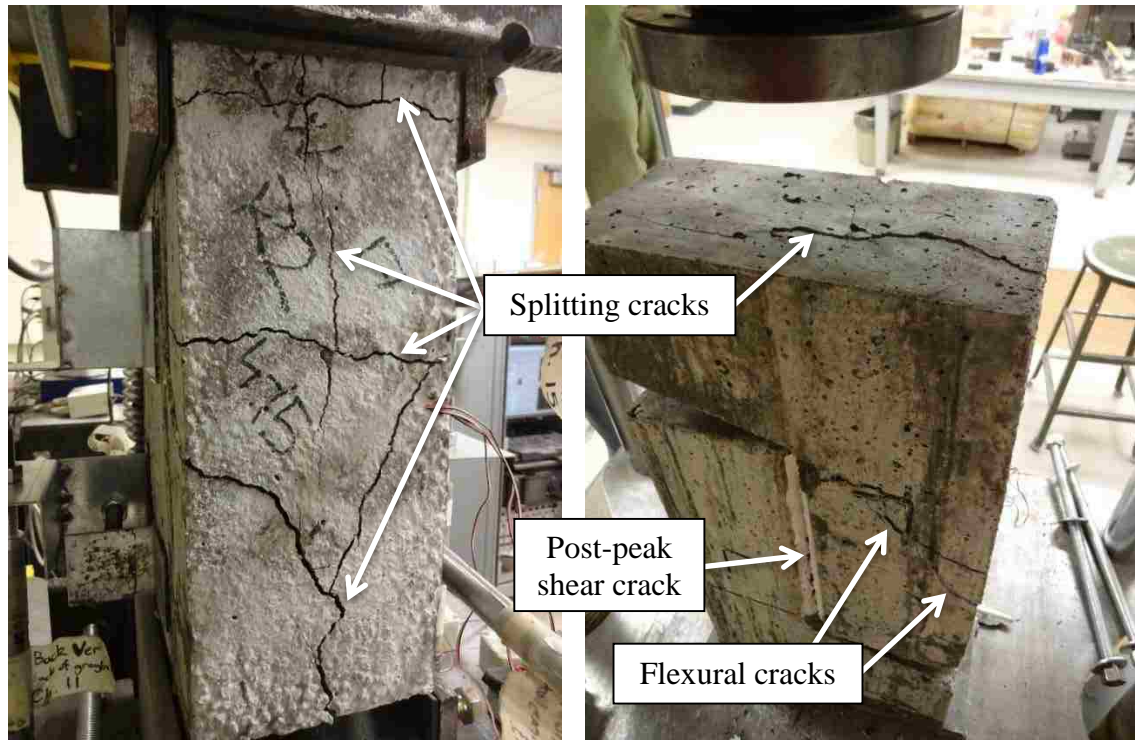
Typical cracking due to concrete splitting failure: side face (left) and top/back face (right); specimen S-CL-CJ-R-17-2 shown
